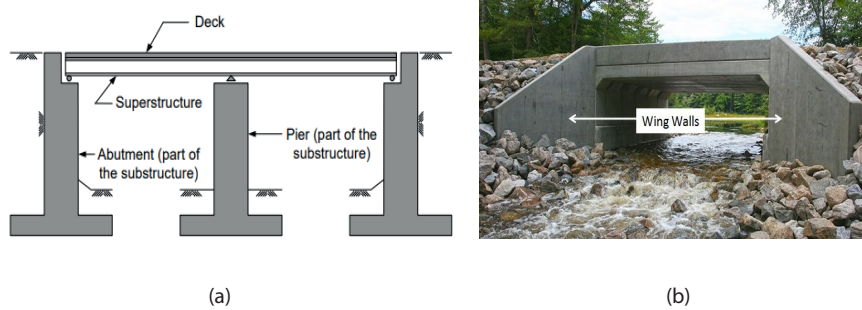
Components of a bridge: (a) pier and abutment; (b) wing wall (source: www.hpdconsult.com/parts-of-a-bridge).
